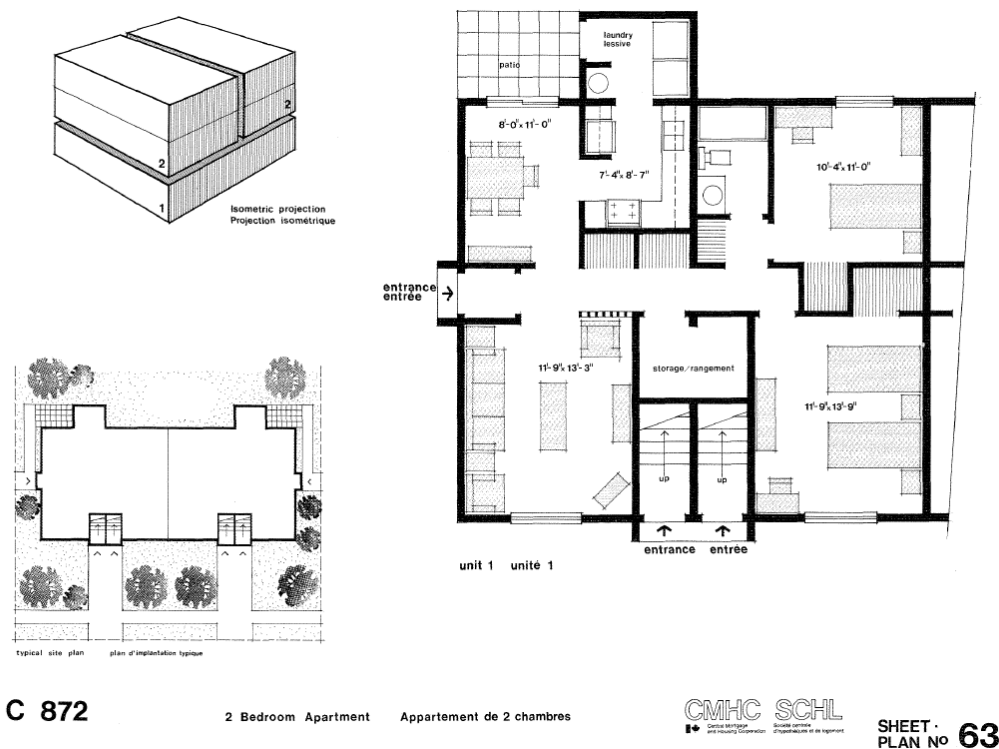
Exemplar MDH site plan CMHC, 1977, p. 13).
